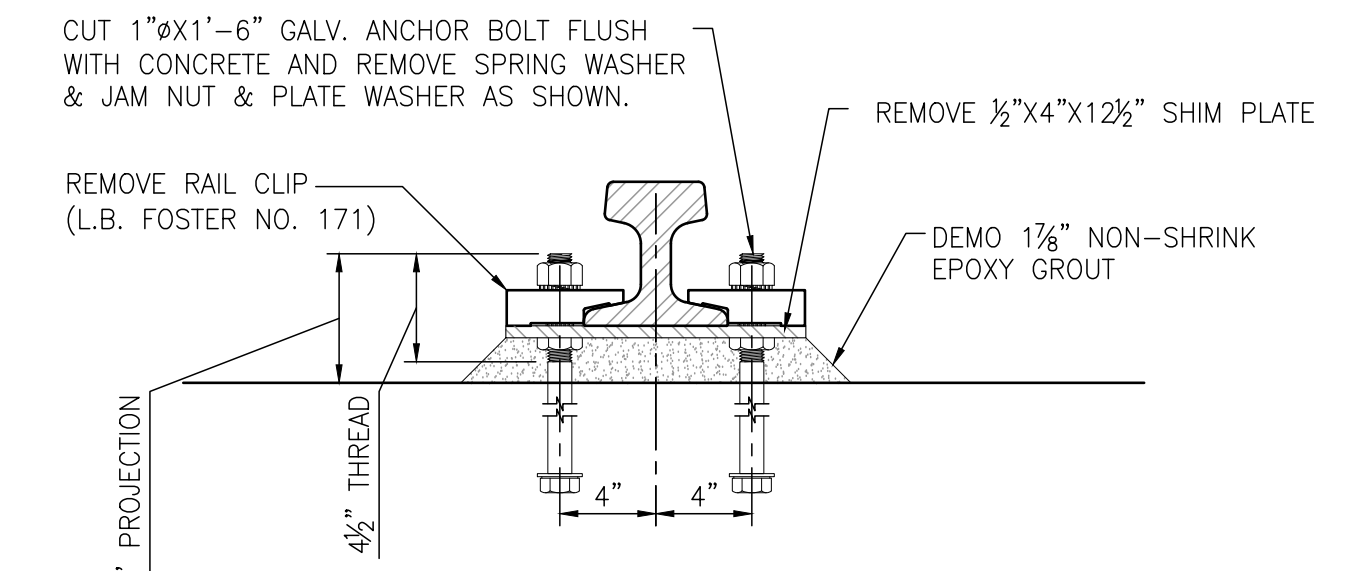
DETAIL ELEV. CRANE RAIL EXPANSION JOINT
